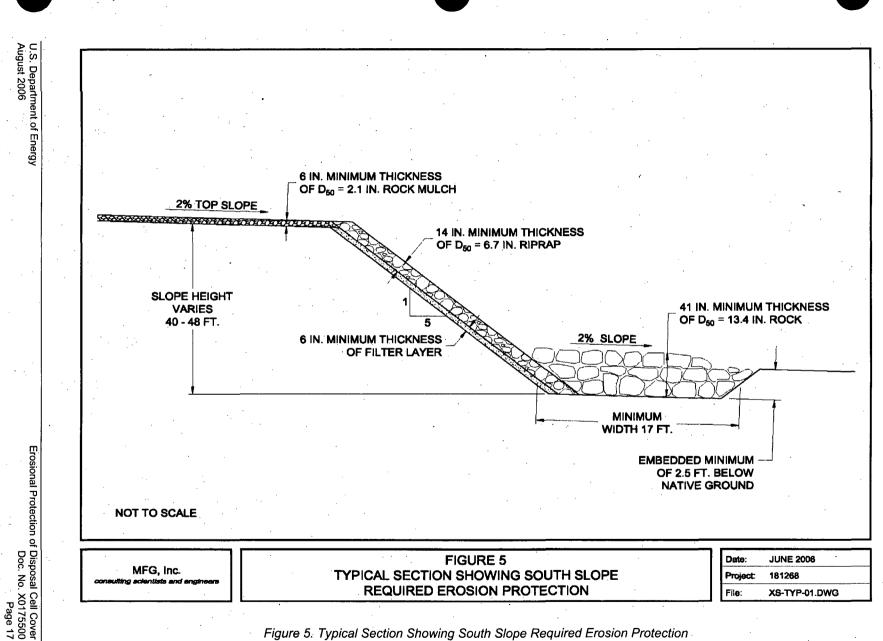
Typical Section Showing South Slope Required Erosion Protection
